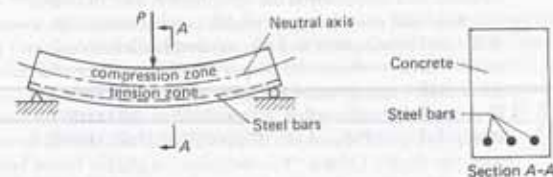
Position of bars in a reinforced concrete beam.
